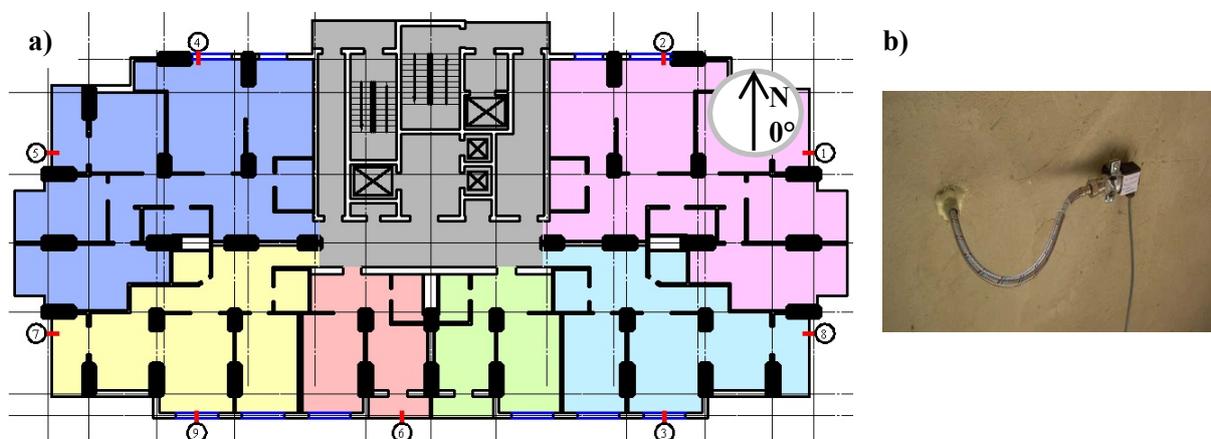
Arrangement of pressure sensors at level 25 of the floor (at a height of 72 m above ground level): a) the floor plan with the location of pressure taps; b) the fixation of pressure transducers.
